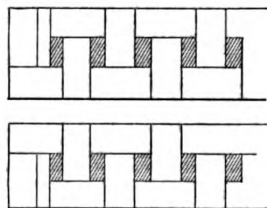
Plan of Wall Shown in Fig. 7 but arranged so as to avoid the use of Half Bricks.
